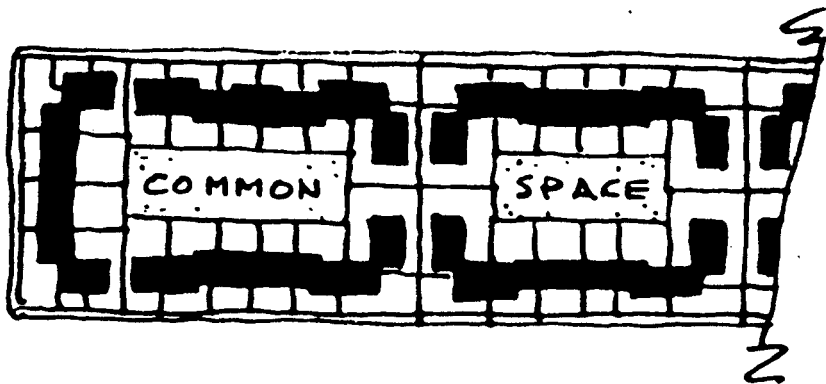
An alternative development - row houses eliminating useless sideyards; well-lit and well-illuminated rooms; usable private yards, plus ample common play space.²⁷
